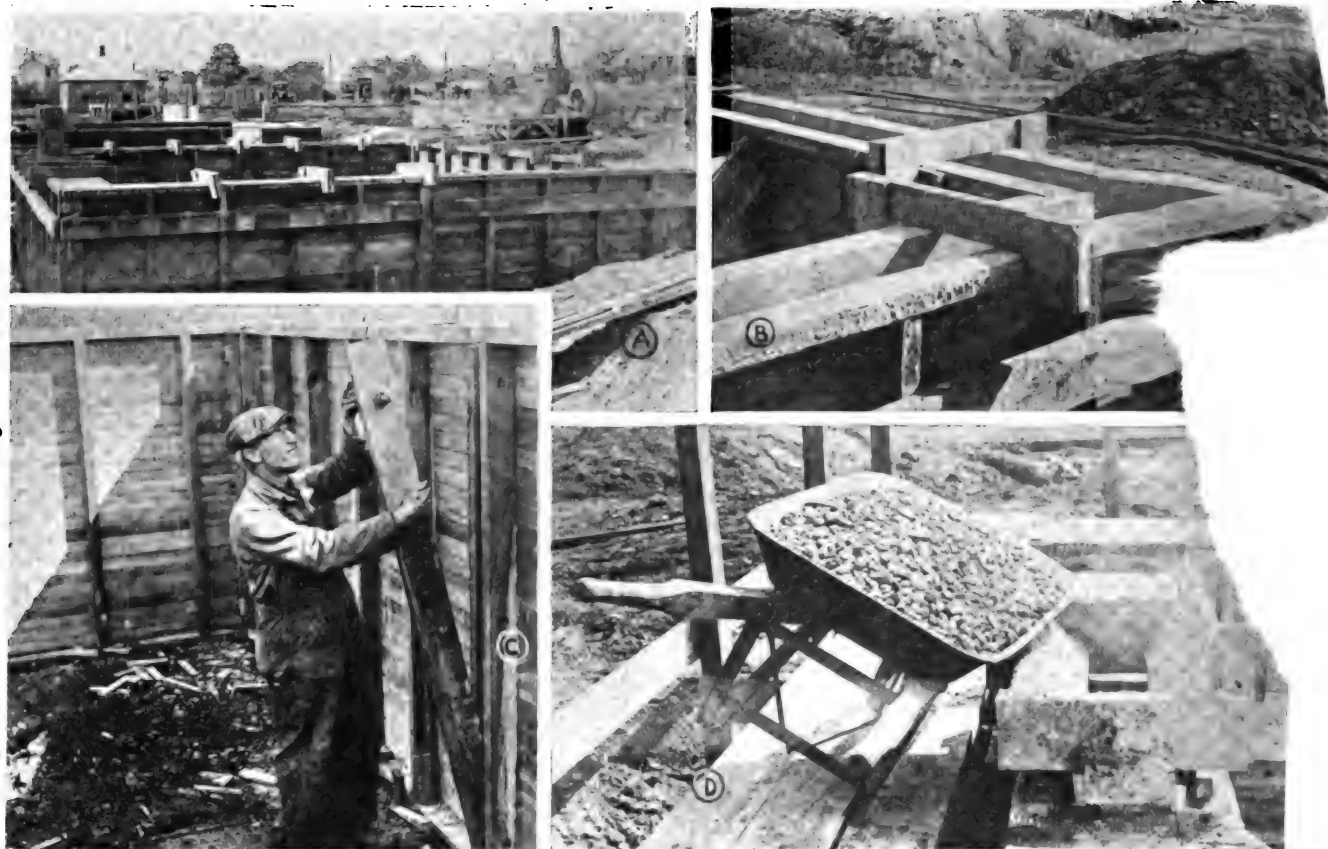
INTERESTING CONCRETE FOUNDATION WORK FOR FRAME HOUSES AT PHILLIPSBURG
